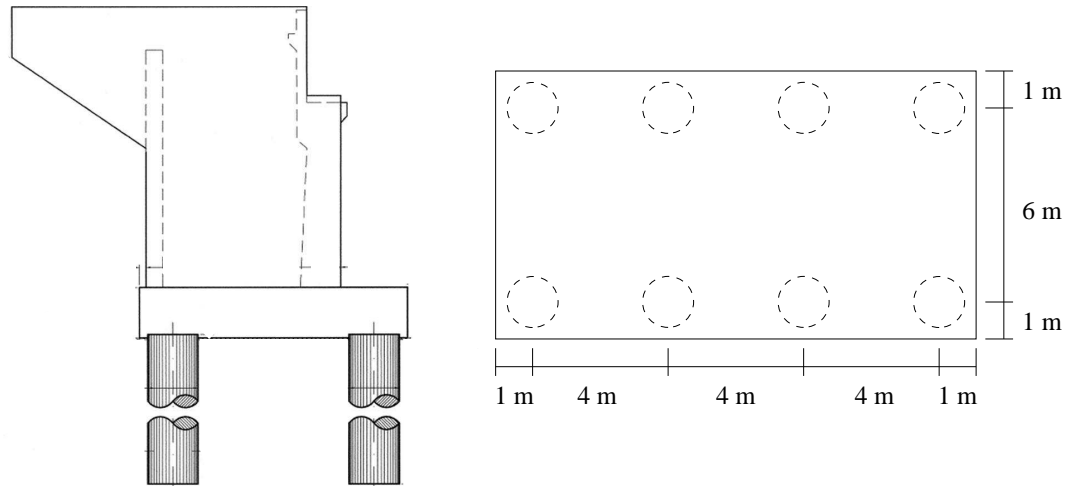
Elevation and plan views of typical abutment for Puente Mataquito (courtesy Ministerio de Obras Públicas, Chile).
